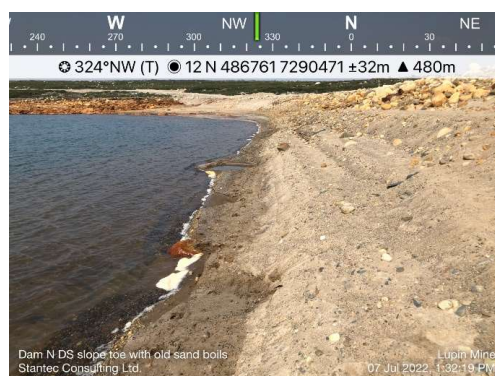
Downstream slope of Dam N with old sand boils near the north abutment.
